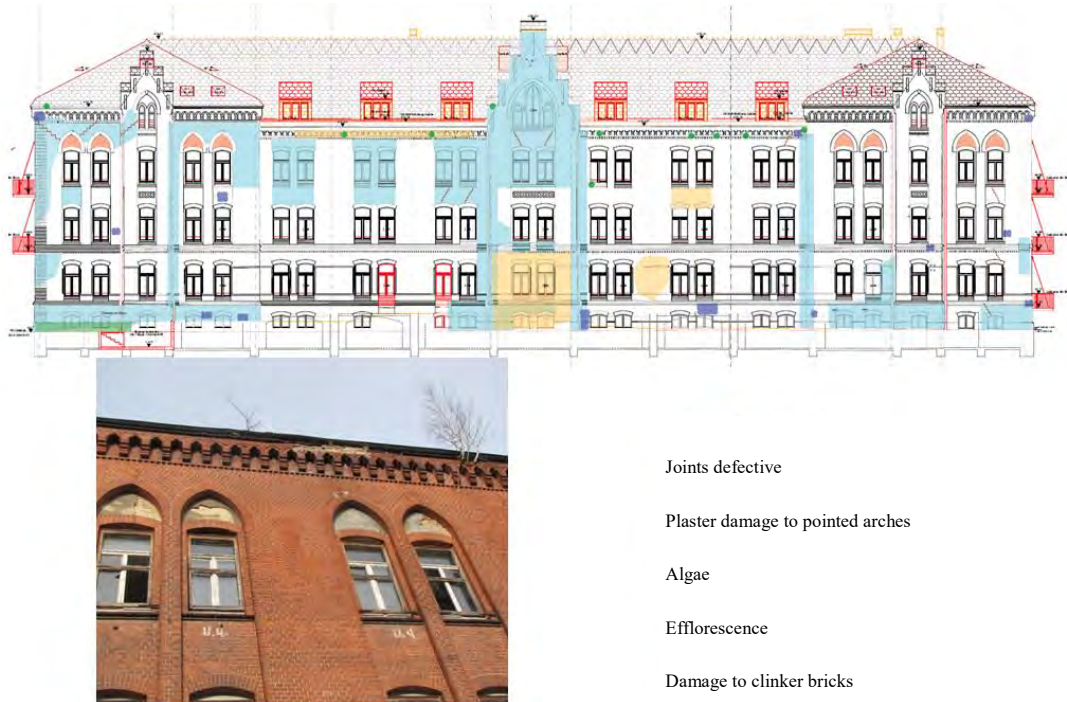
Representation of the existing damage pattern on the façade.
